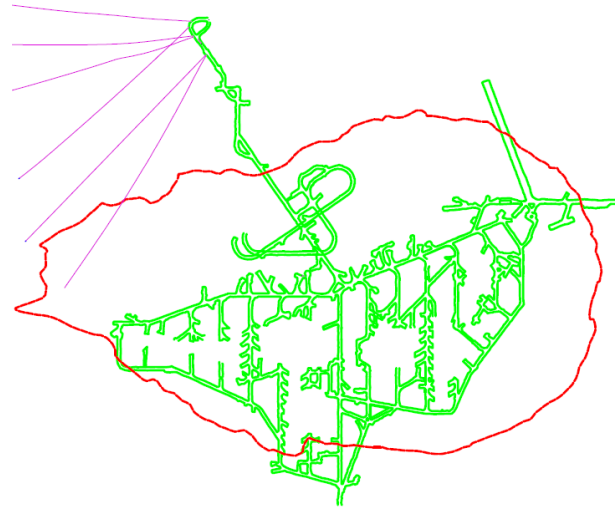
Plan view drawing of pit outline showing some underground mine developments and drillholes at the case study mine
